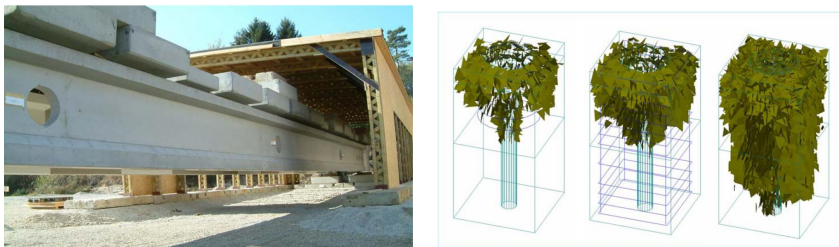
a) Experimental beam loaded with concrete sleepers, b),anchorage zone
